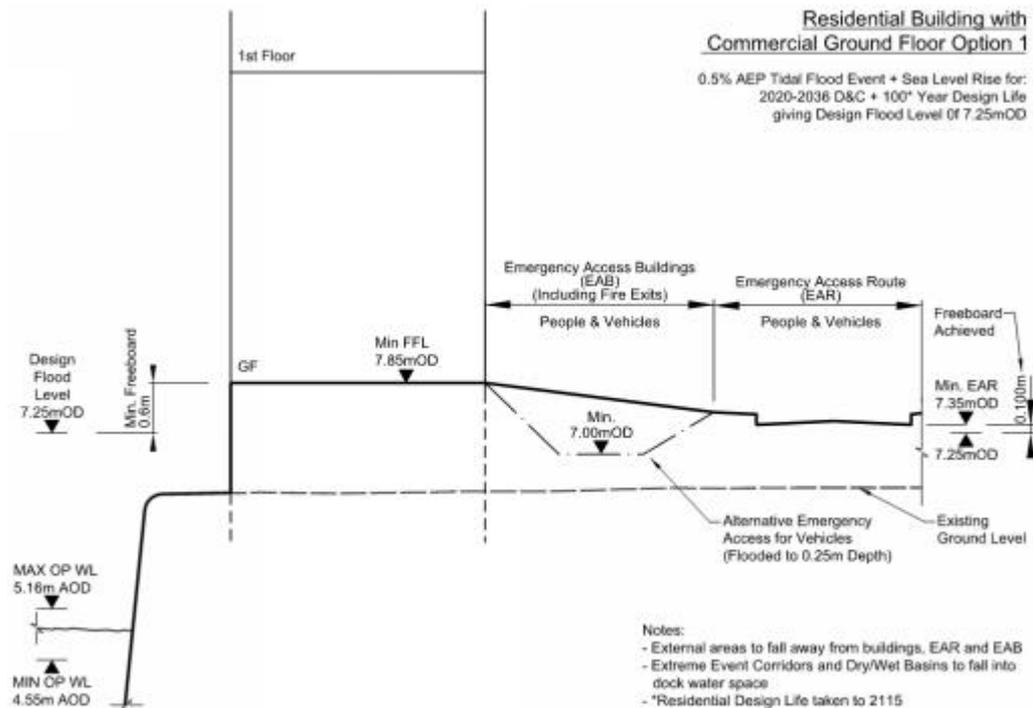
Curtins Condition 21 Report Residential Building with Commercial Floor Levels
